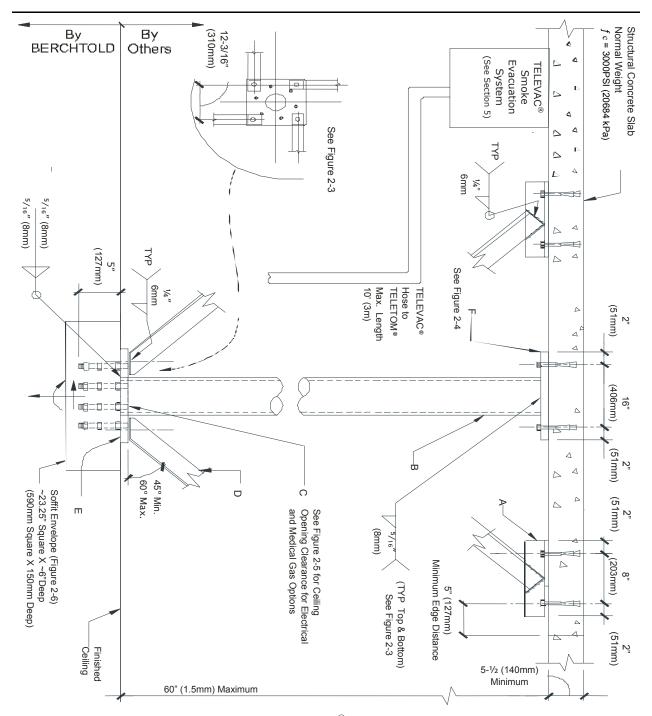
Recommended TELETOM® Single Mount Superstructure Design and Construction Materials
